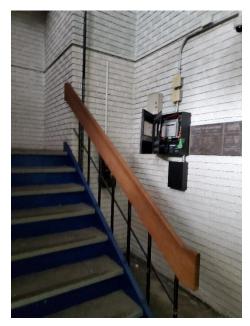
View of the stairs at the front of the building leading to the viewing area on the second floor.
